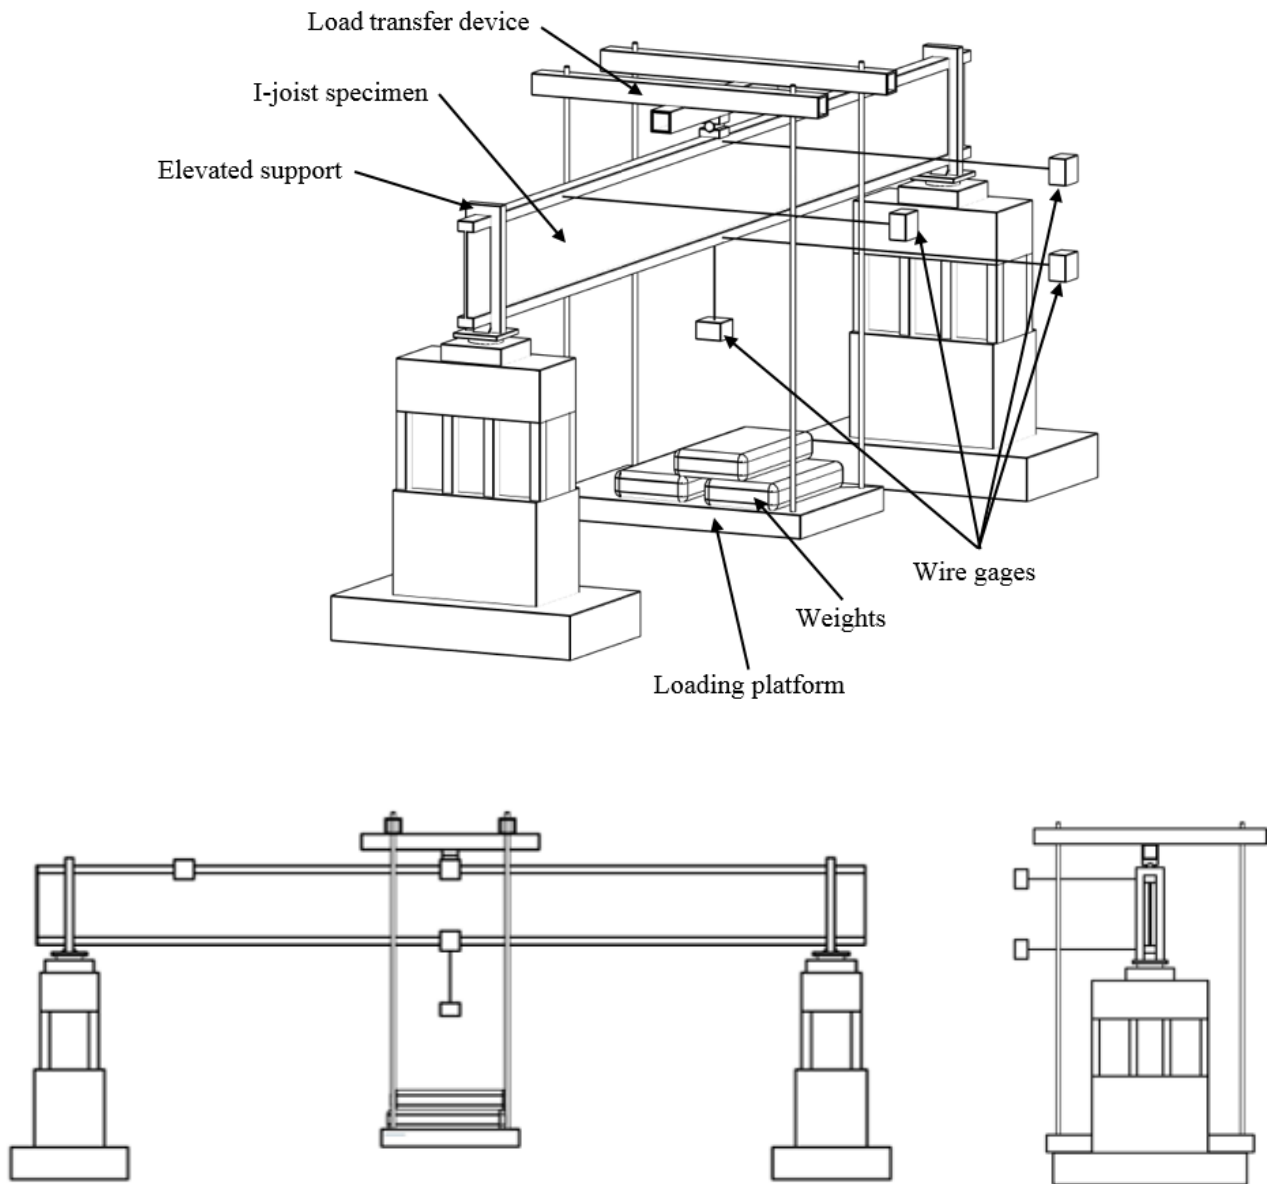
Schematic drawings of the lateral torsional buckling test configuration
